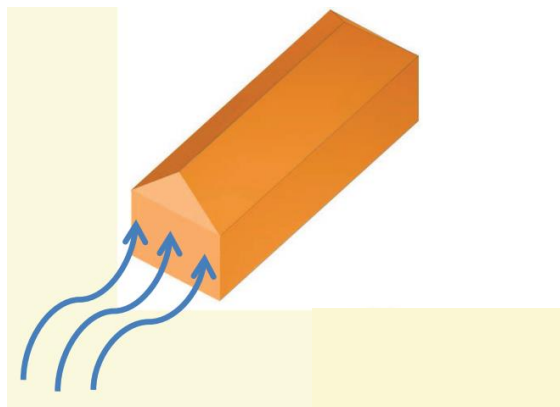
Shorter Side of the Building is Oriented to Face the Direction of Flooding
